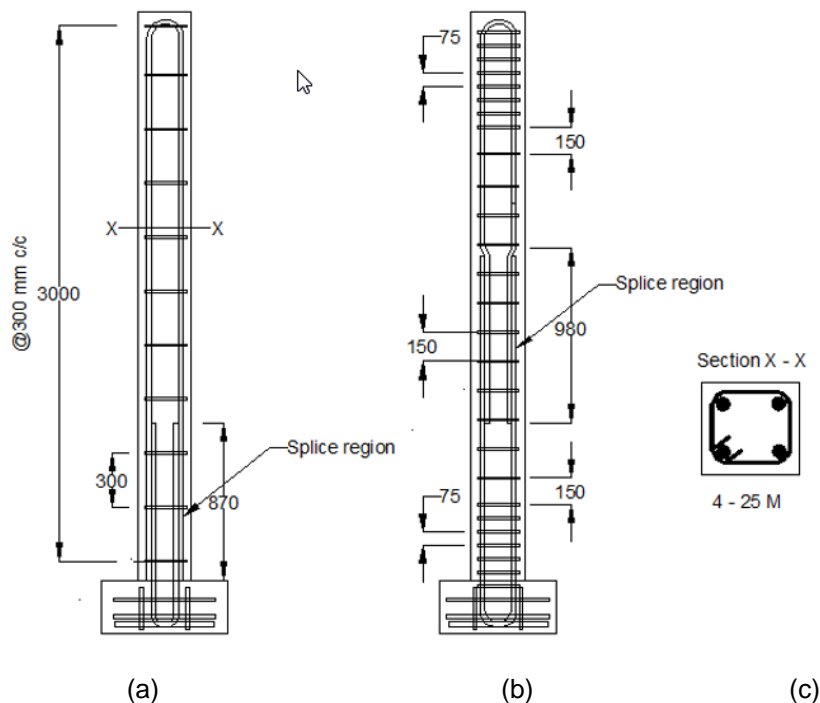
Column details showing transverse detailing: (a) conventional columns (b) seismic columns (Siba (2014)).
